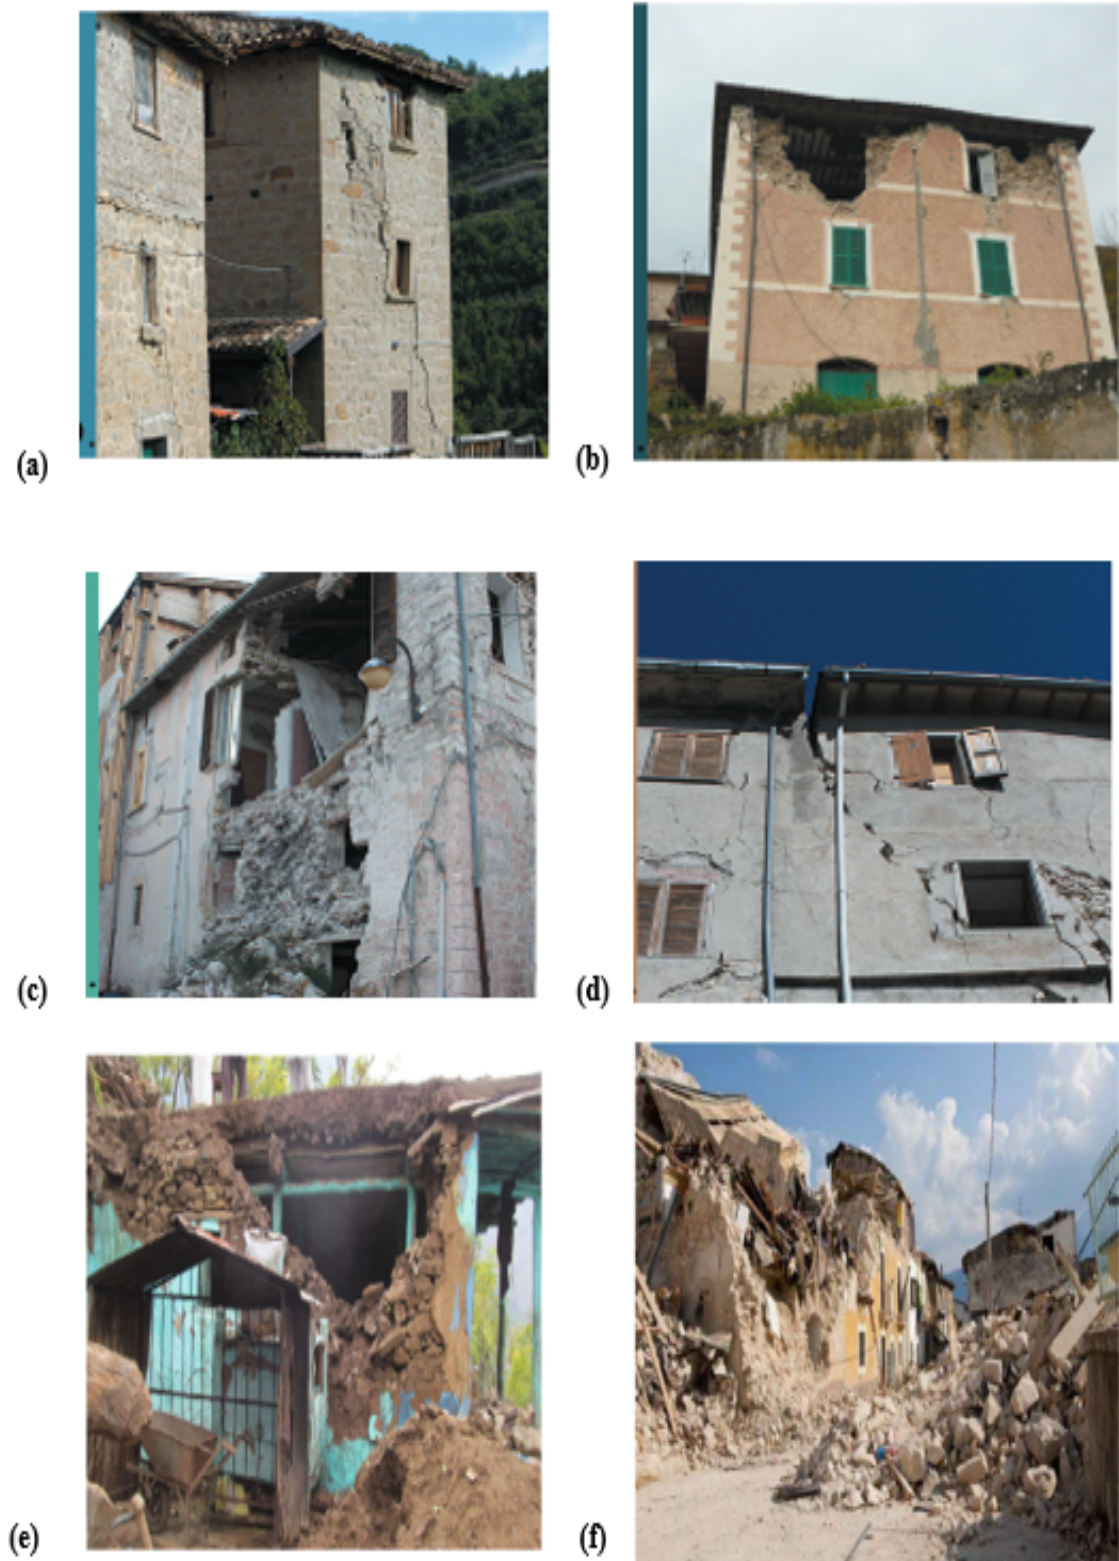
Conventional masonry failures: (a) corner overturning, (b) horizontal bending provoking out-of-plane leaves separation, (c) masonry crumbling, (d) pounding [2], (e) Out of plan failure of unreinforced masonry wall and (f) collapse of masonry building [20].
